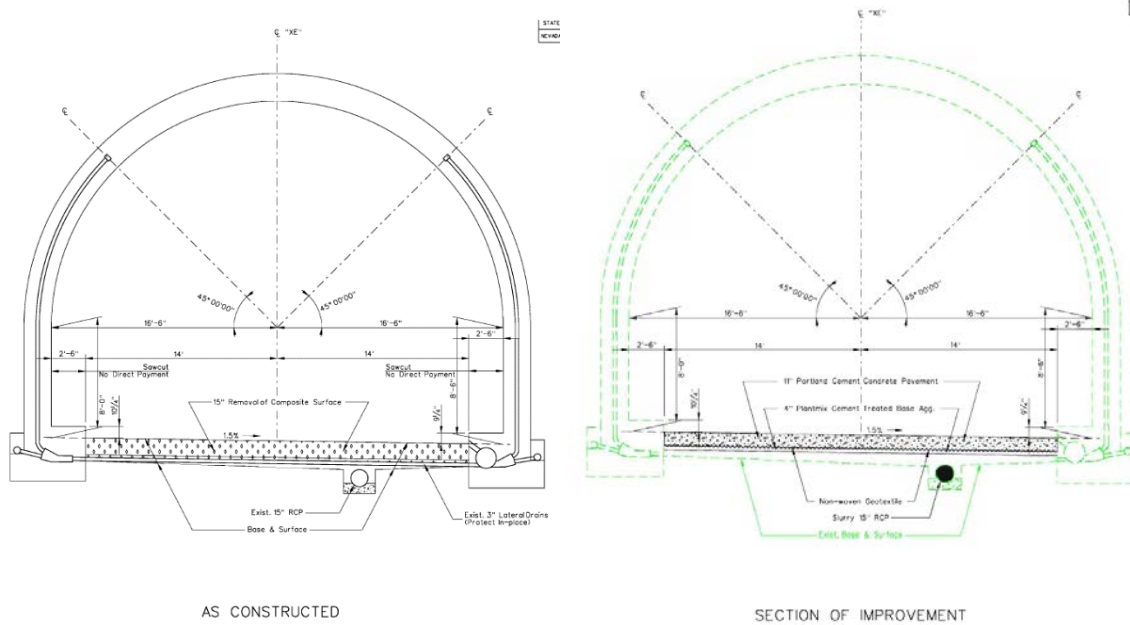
Diagram. Typical section of (a) existing and (b) proposed tunnel and pavement structures.
